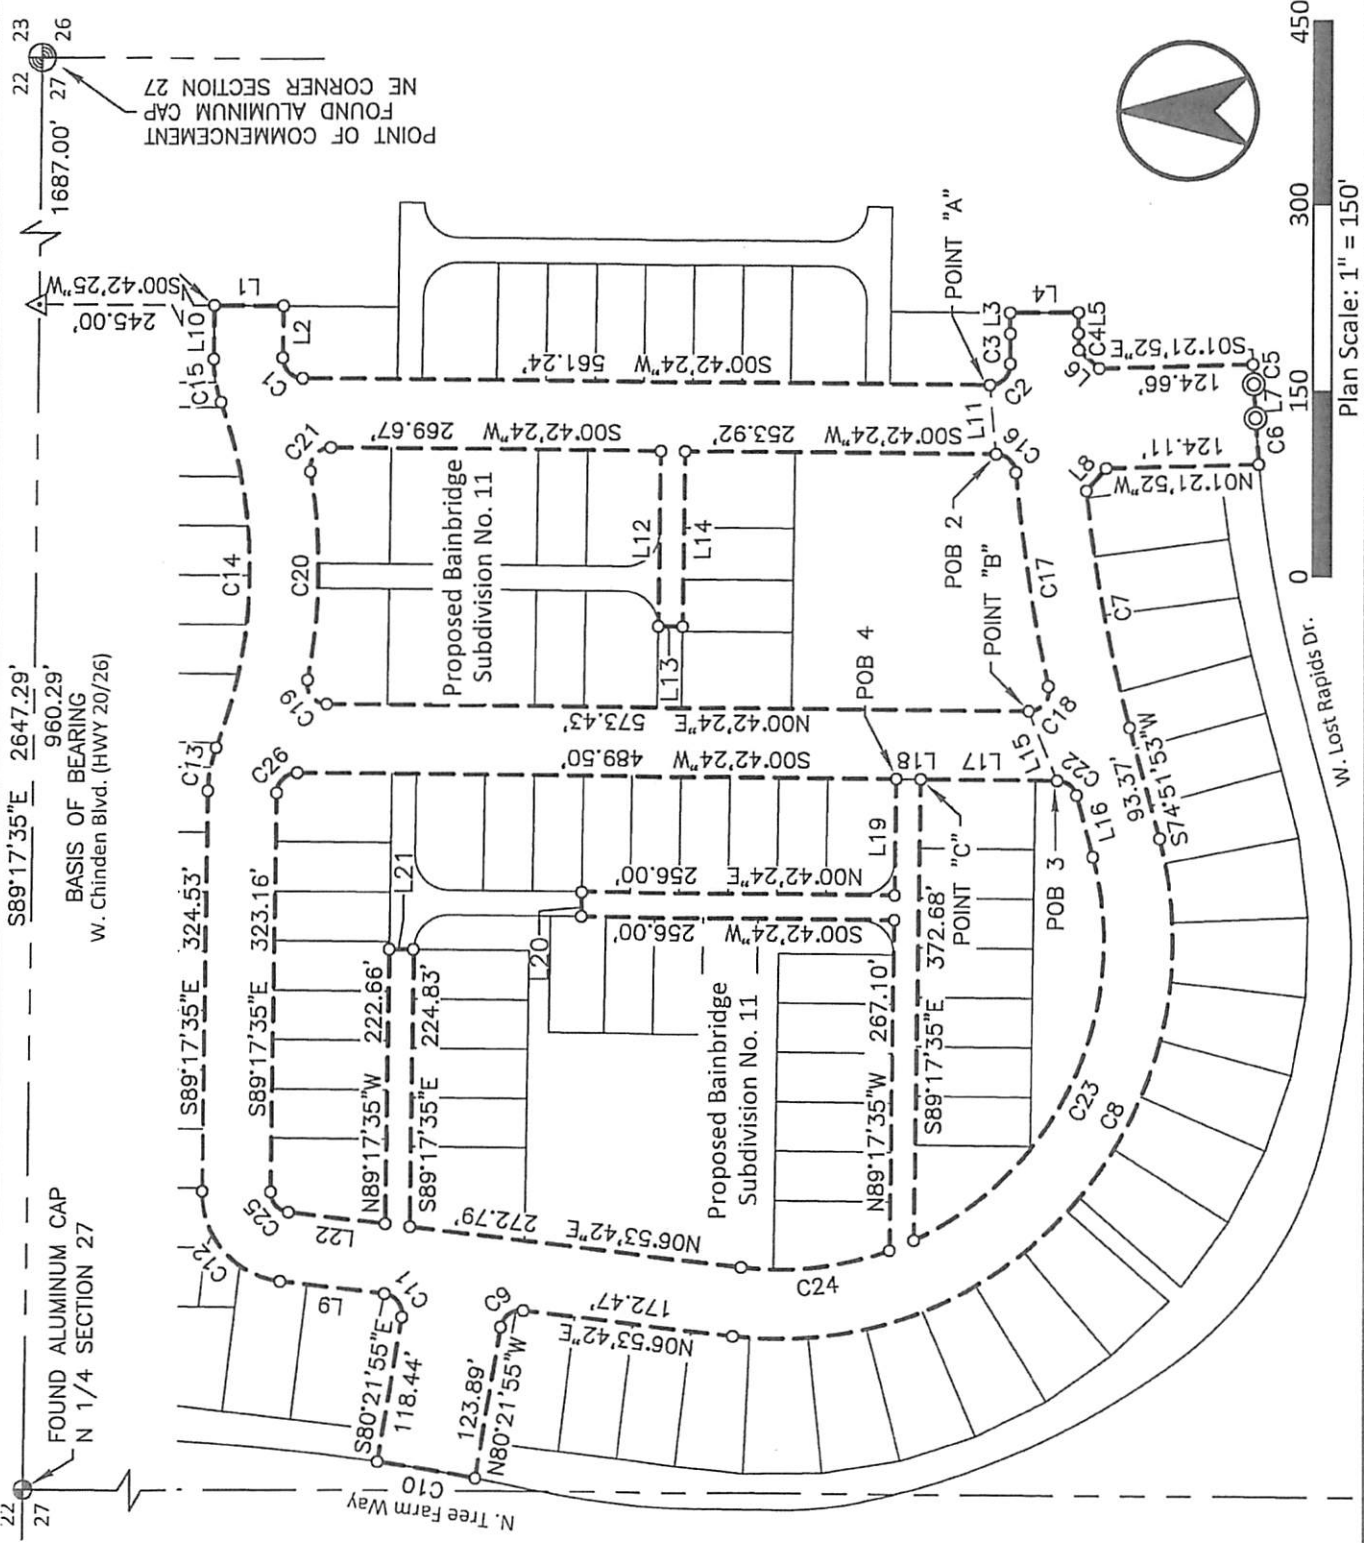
EXHIBIT B - Meridian Sewer and Water Easement Bainbridge Subdivision No. 11
